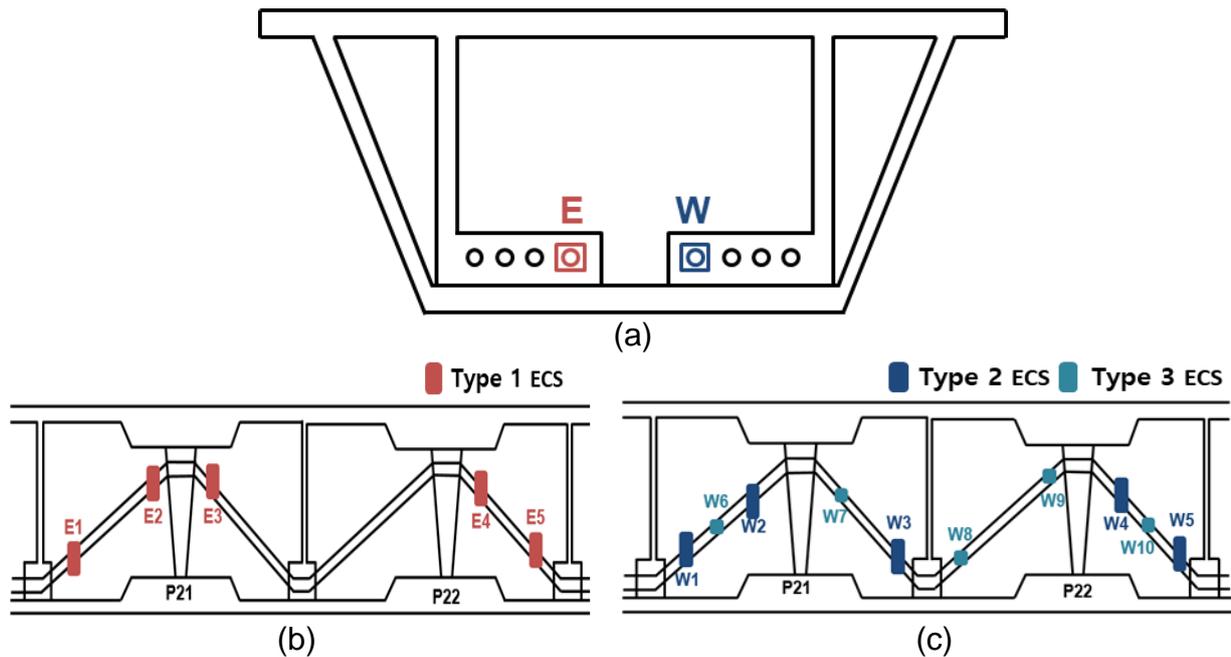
(a) A front cross-section view of the Jeongleungcheon Bridge P21 girder;
